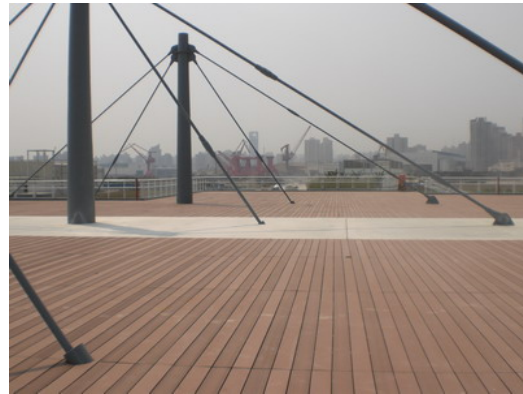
Plastic-Wood Floor of Elevated Pedestrians' Walk
